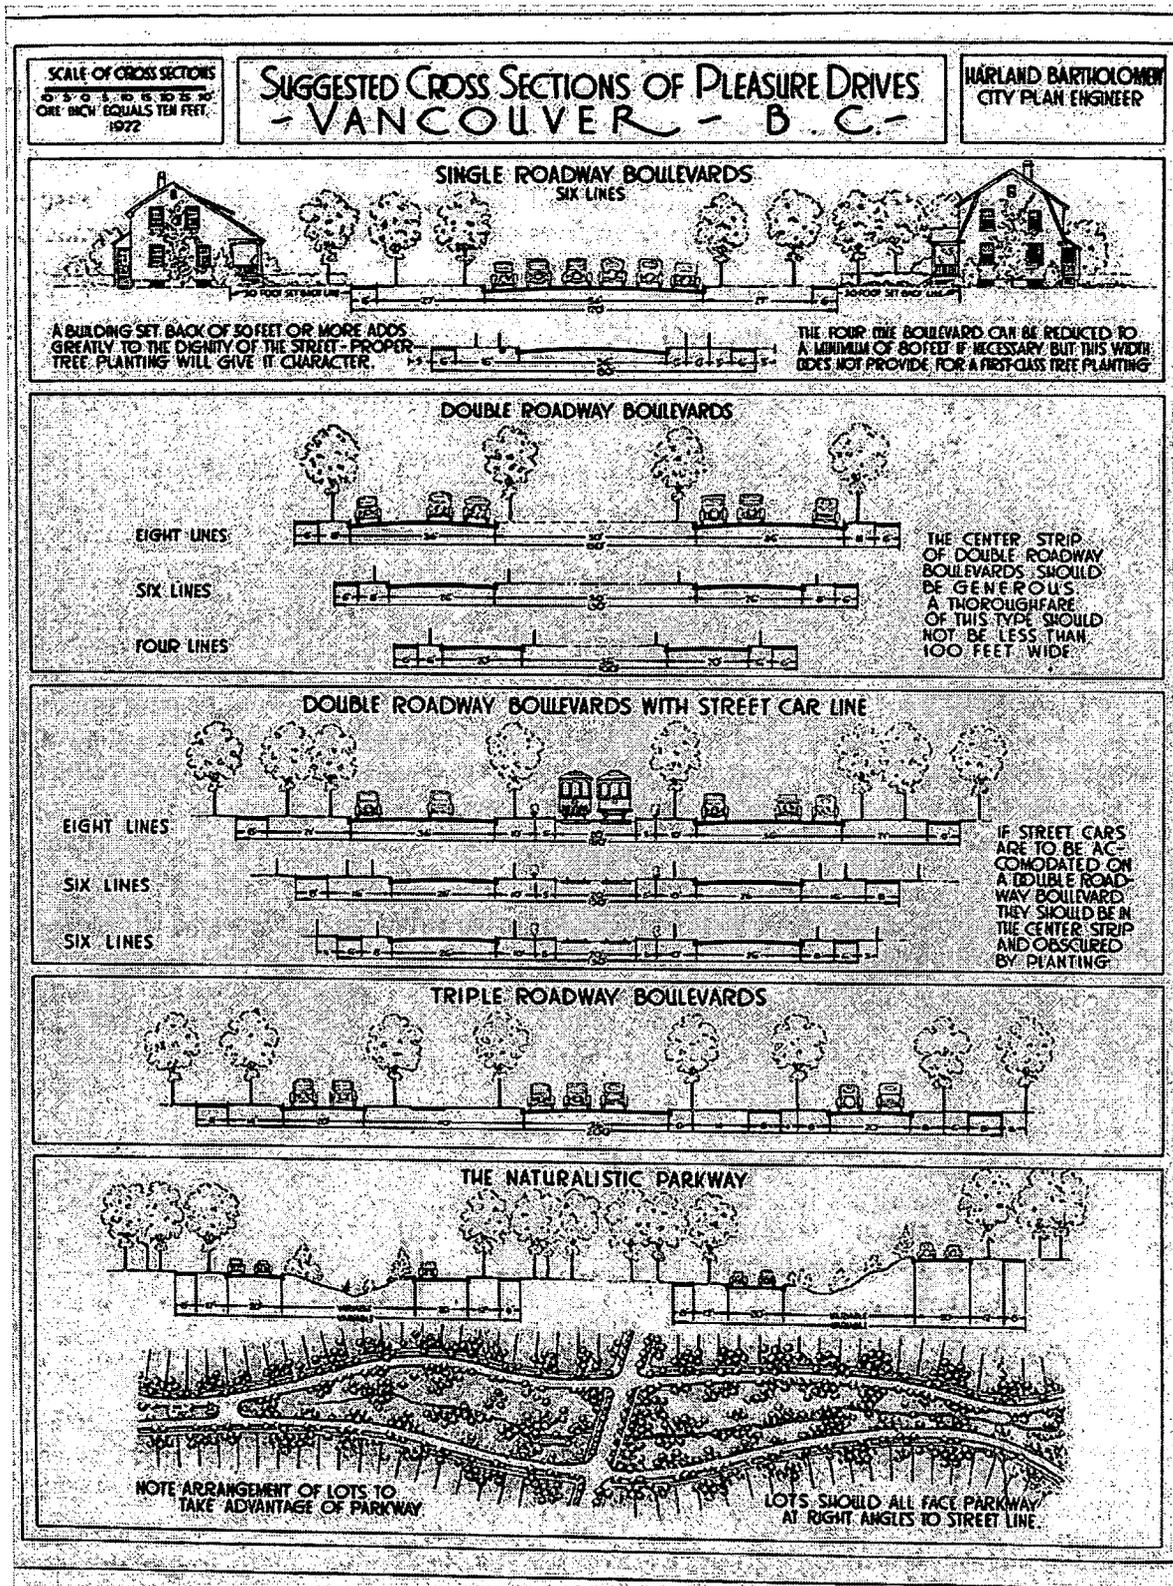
Street sections showing typical single family house and street trees, from "Suggested Cross Sections of Pleasure Drives," Ibid.
